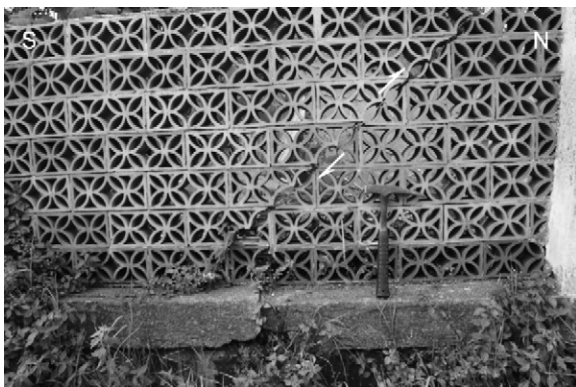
Photograph of a reverse fault, south-dipping, dissecting a concrete wall close to Presa village. For the location see Fig. 3.
